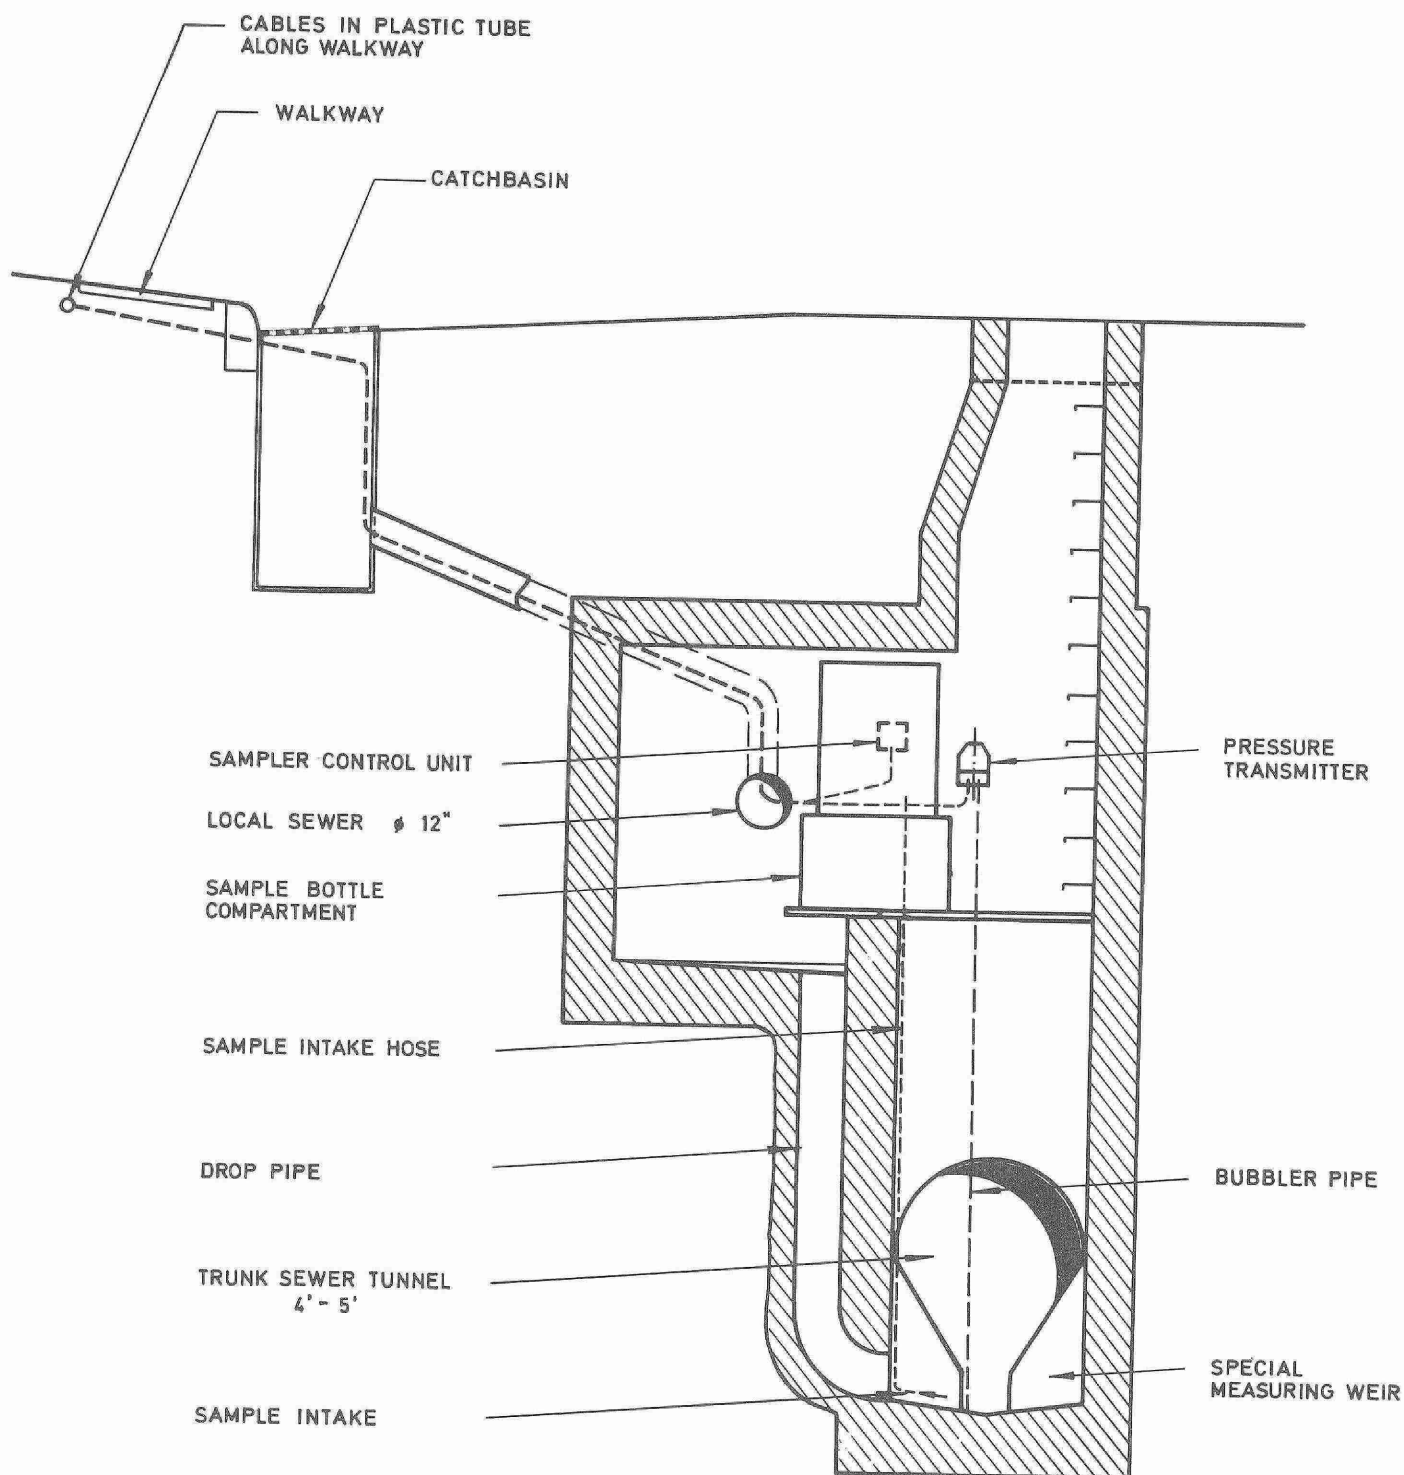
INSTRUMENTATION SCHEMATIC - SECTIONAL VIEW OF MANHOLE
